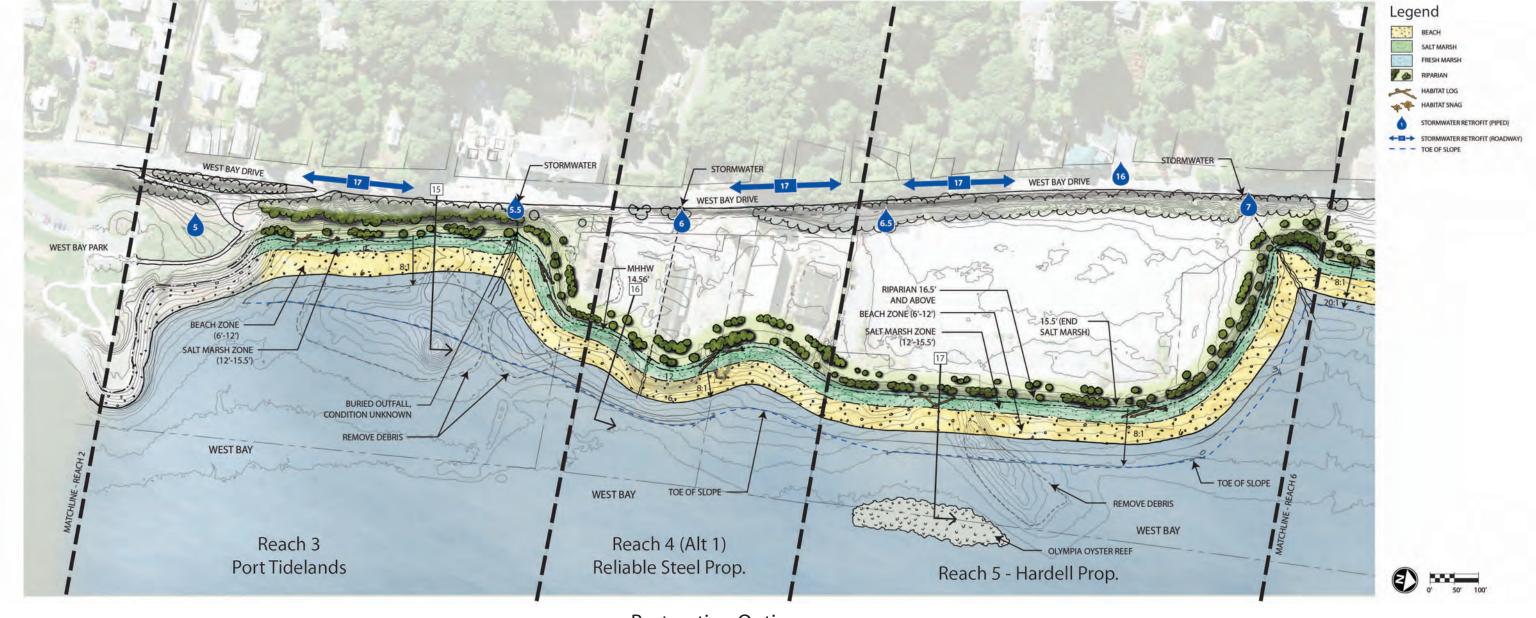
# Exhibit E Shoreline Conceptual Restoration Plan – West Bay Yards
